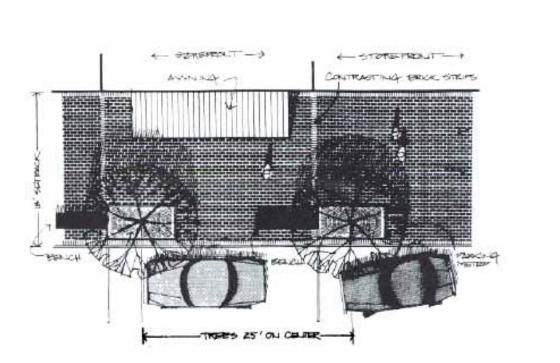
SAMPLE STREETSCAPE IN PLAN VIEW. Note location of trees to avoid interfering with opening passenger doors on parked cars.
